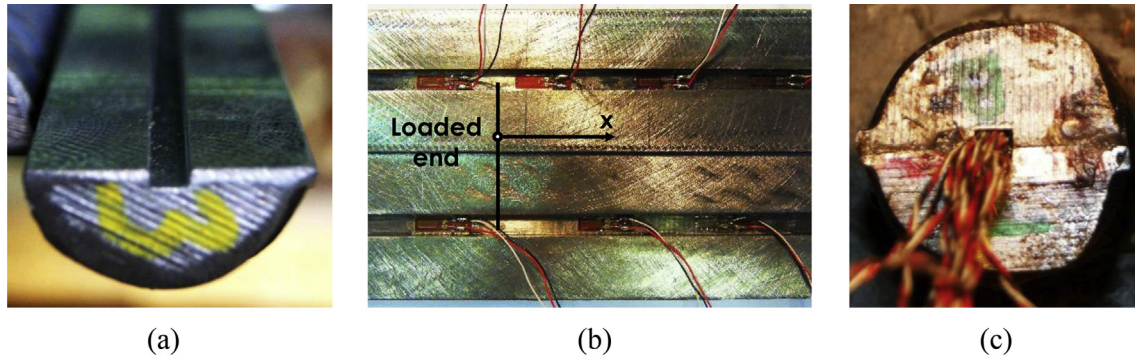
Internal instrumentation, (a) half bar milled and grooved, (b) typical gauge arrangement of bar ER1, (c) wires at glued bar end.
